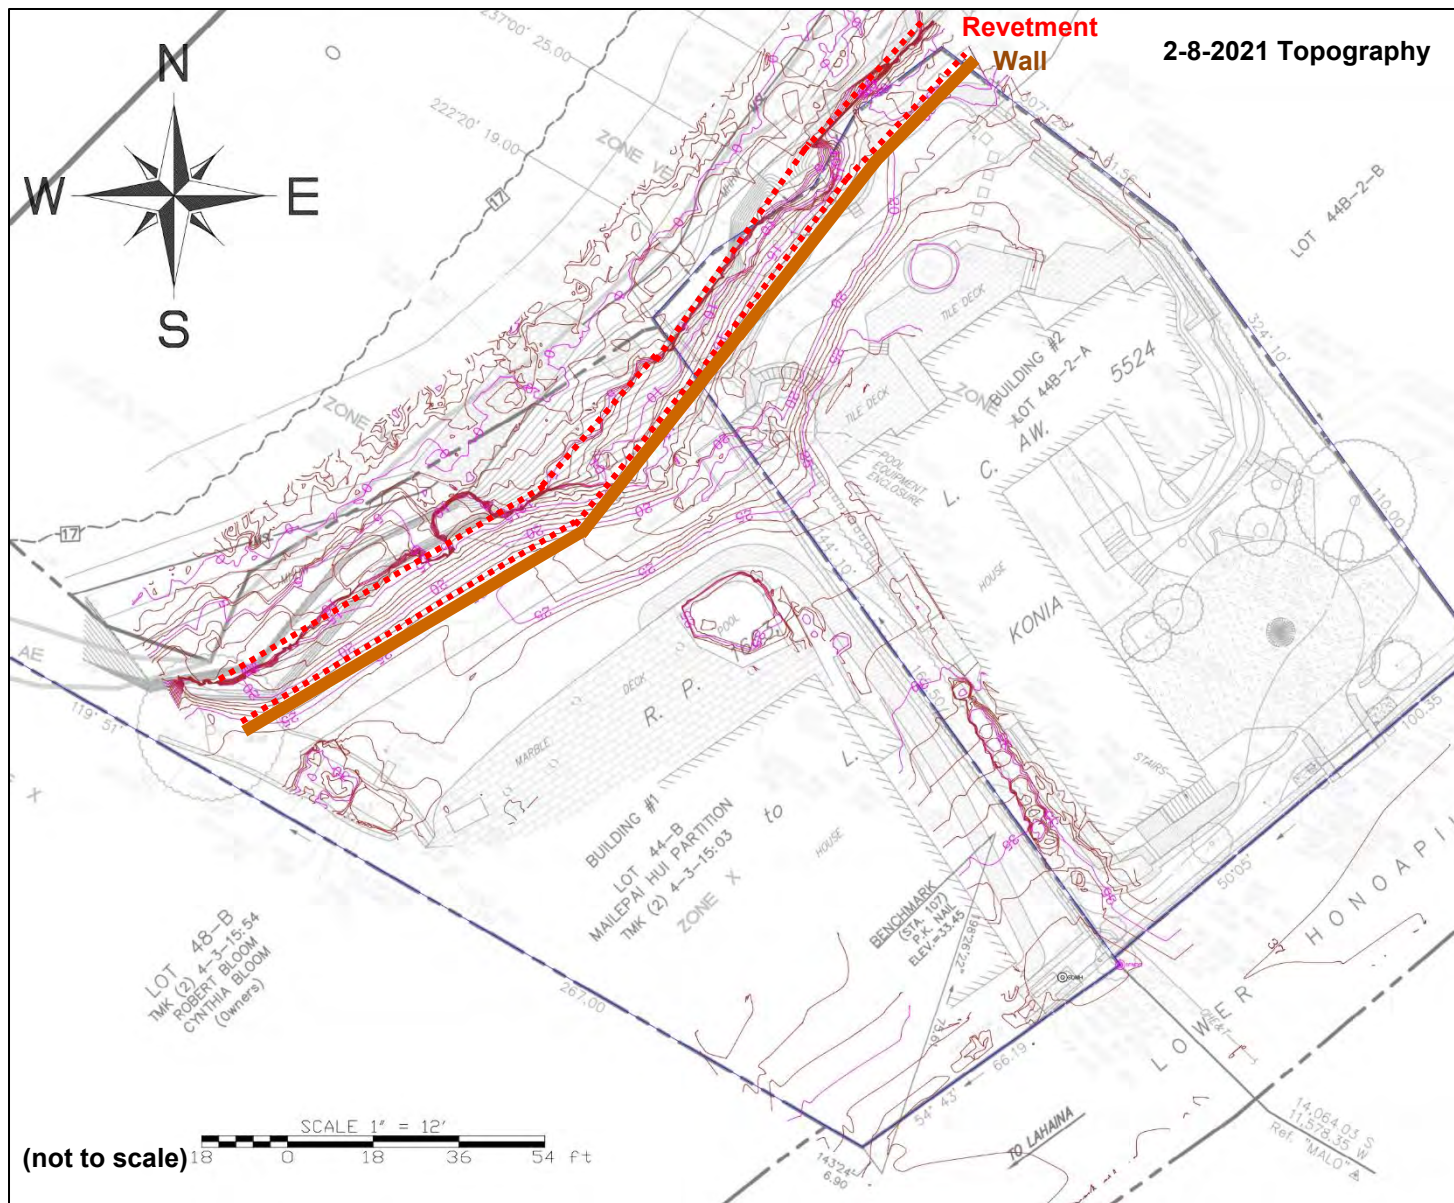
Concept plan view for a hybrid revetment-wall alternative
